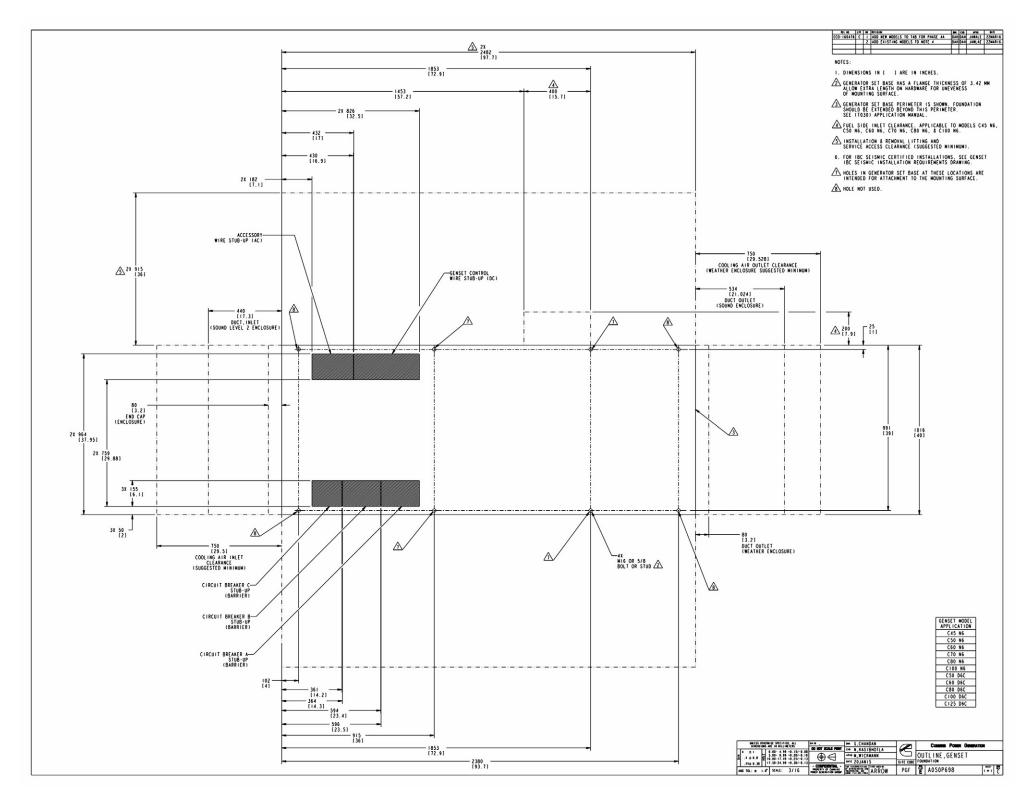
FOUNDATION OUTLINE (SHEET 1 OF 1)
